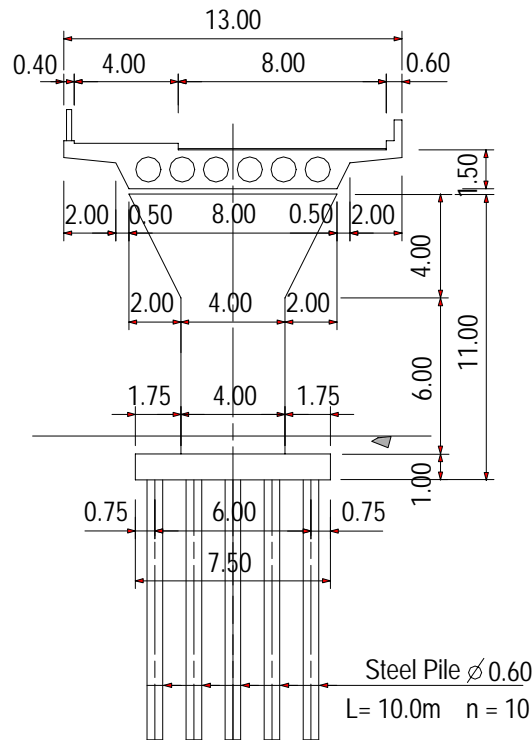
Cross Section of Proposed Bridge Structure
